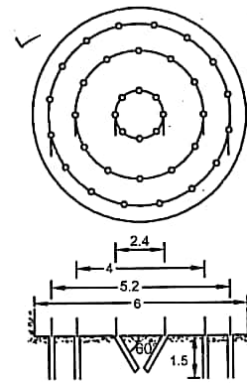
Blast holes in a sinkin shaft (All the dimension are in metres)
